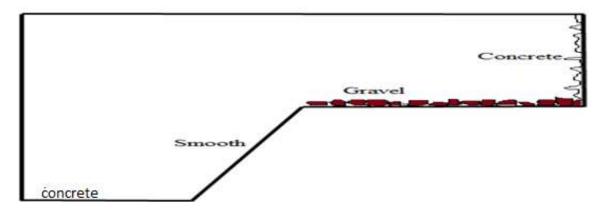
Half cross sectional view of the channel with gravel as floodplain and concrete as the main channel
